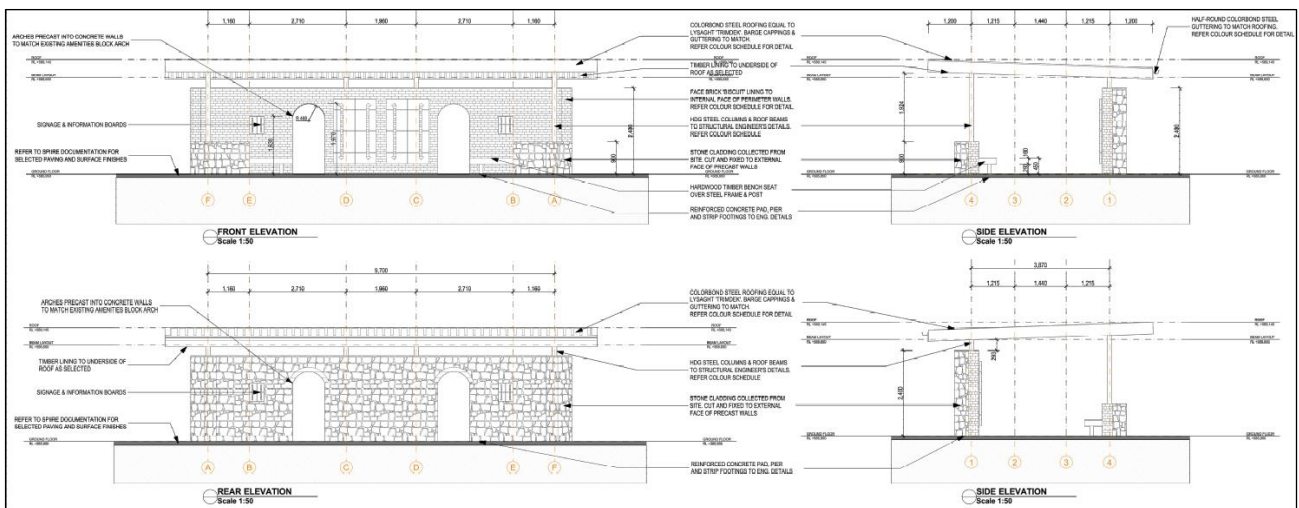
Proposed Reconstructed Heritage Item as a bus shelter
